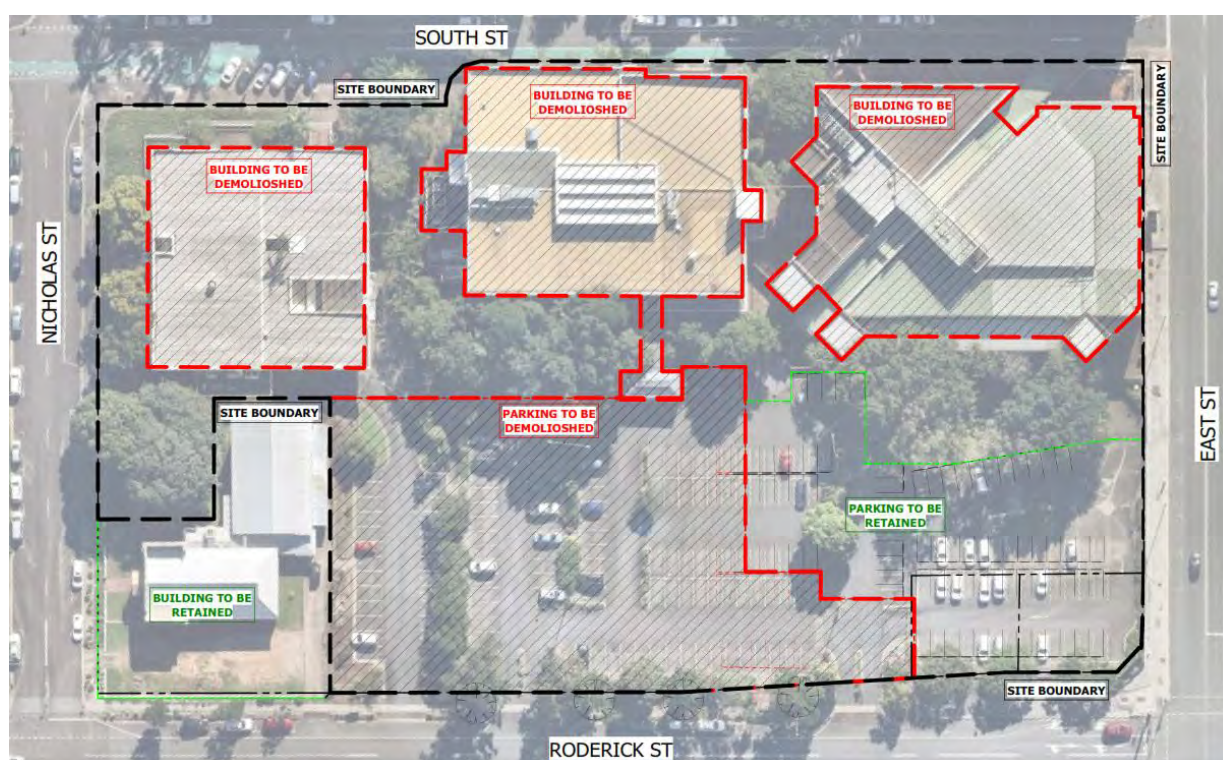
Existing site plan of the subject property, showing elements proposed for demolition (red line).
